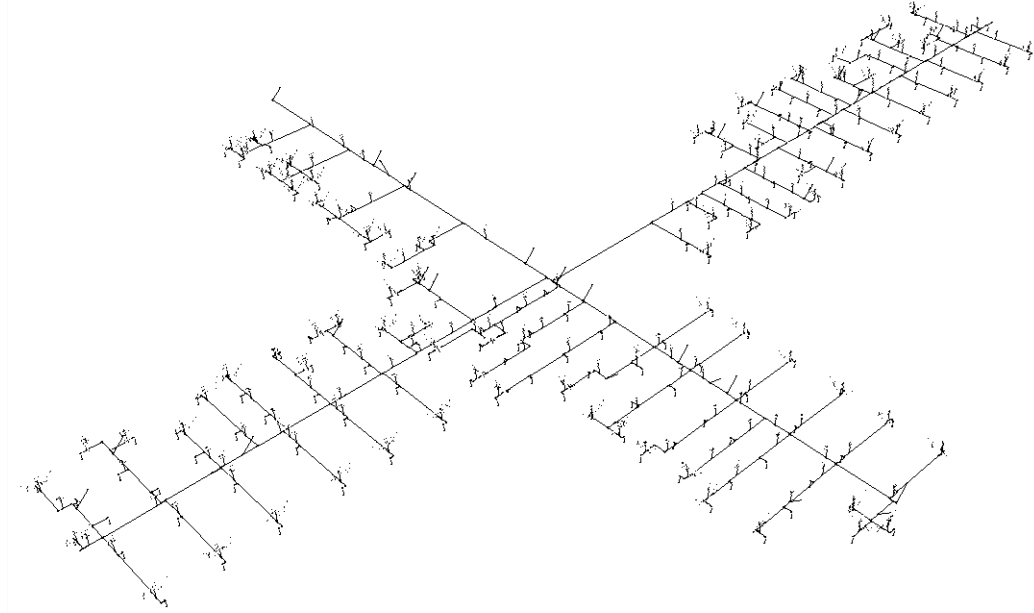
3-D view of UCSF medical center sprinkler piping system
